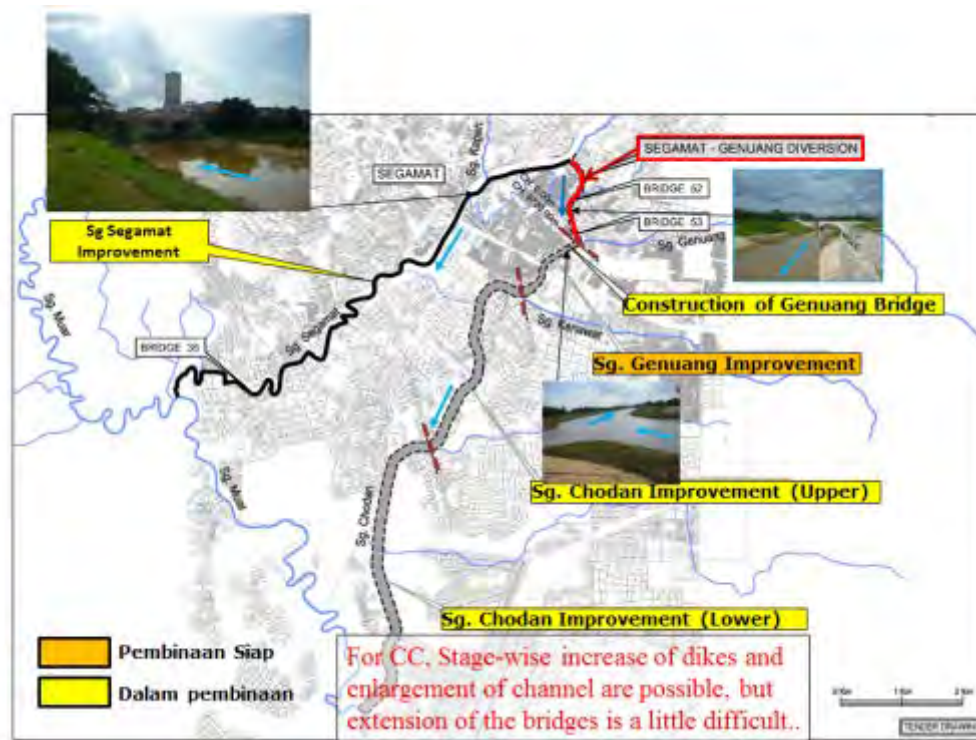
Under-construction of the flood control project in the Segamat River
